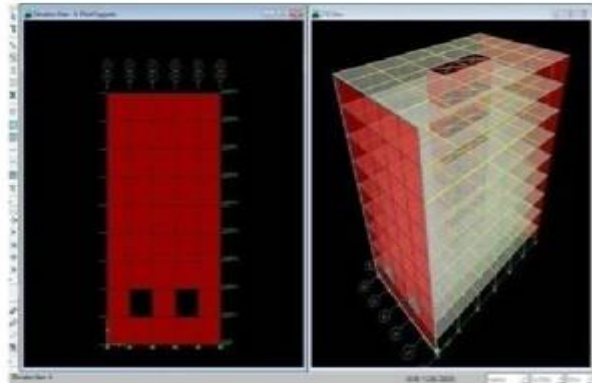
showing G+9 Storey Building with Without Shear Wall Shear wall opening in the Second Storey
